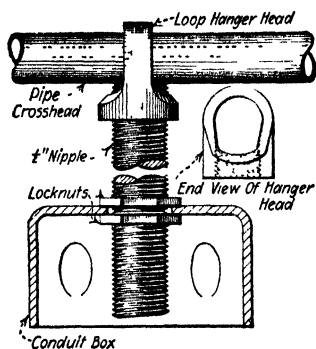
Thomas & Betts conduit-box hanger arranged for a heavy-fixture outlet.
